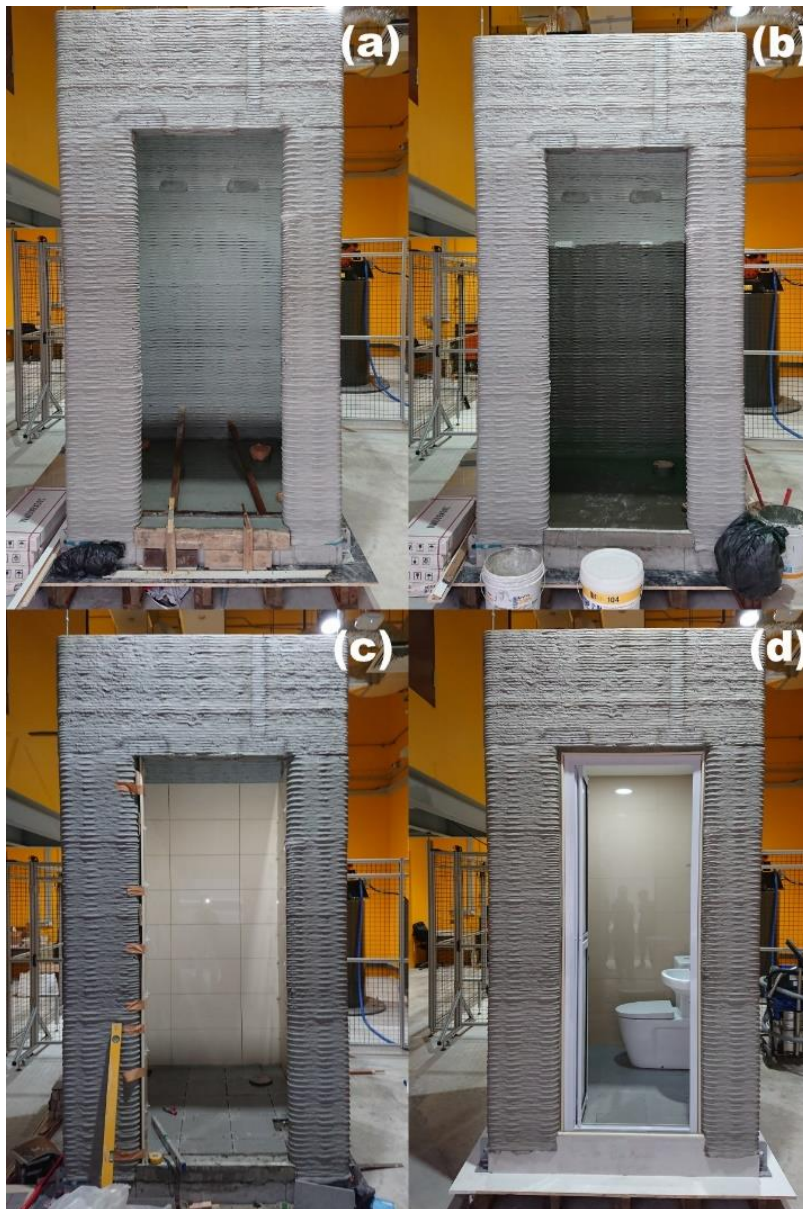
Post-processing after the 600 mm part is stacked above the 2200 mm part (a) casting of the door threshold (b) waterproofing applied (c) tiling of the wall and floor completed (d) post-processing process completed.
